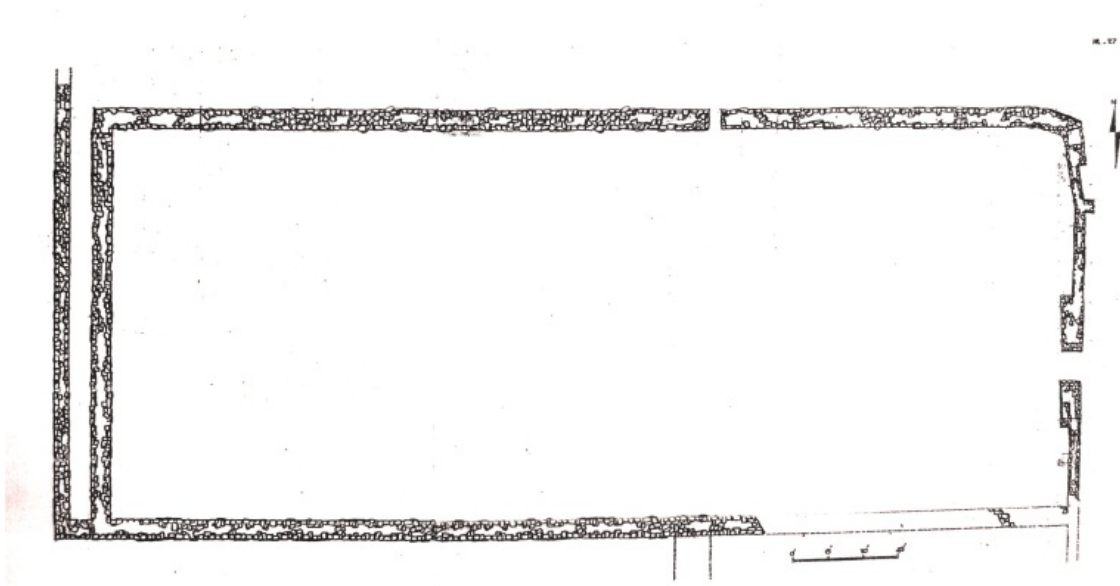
HL-27, Rectangular structure inside the city wall and near the northern city wall (From U Myint Aung, 2007)
